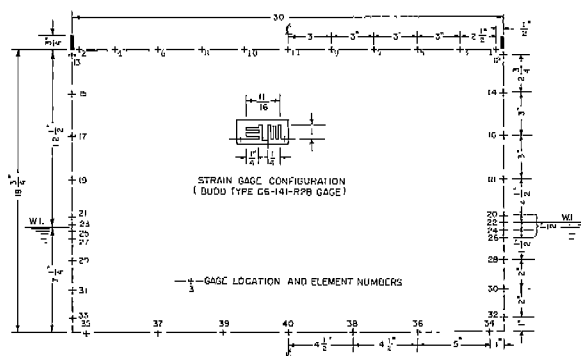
GAGE LAYOUT, TRANSVERSE SECTION.
